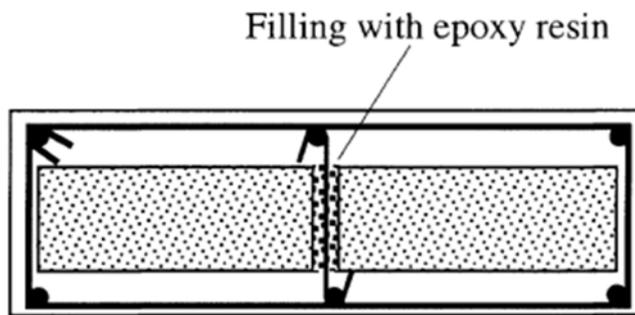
Placement of Internal Stirrups in Rectangular Cross Section With a Large Aspect Ratio
